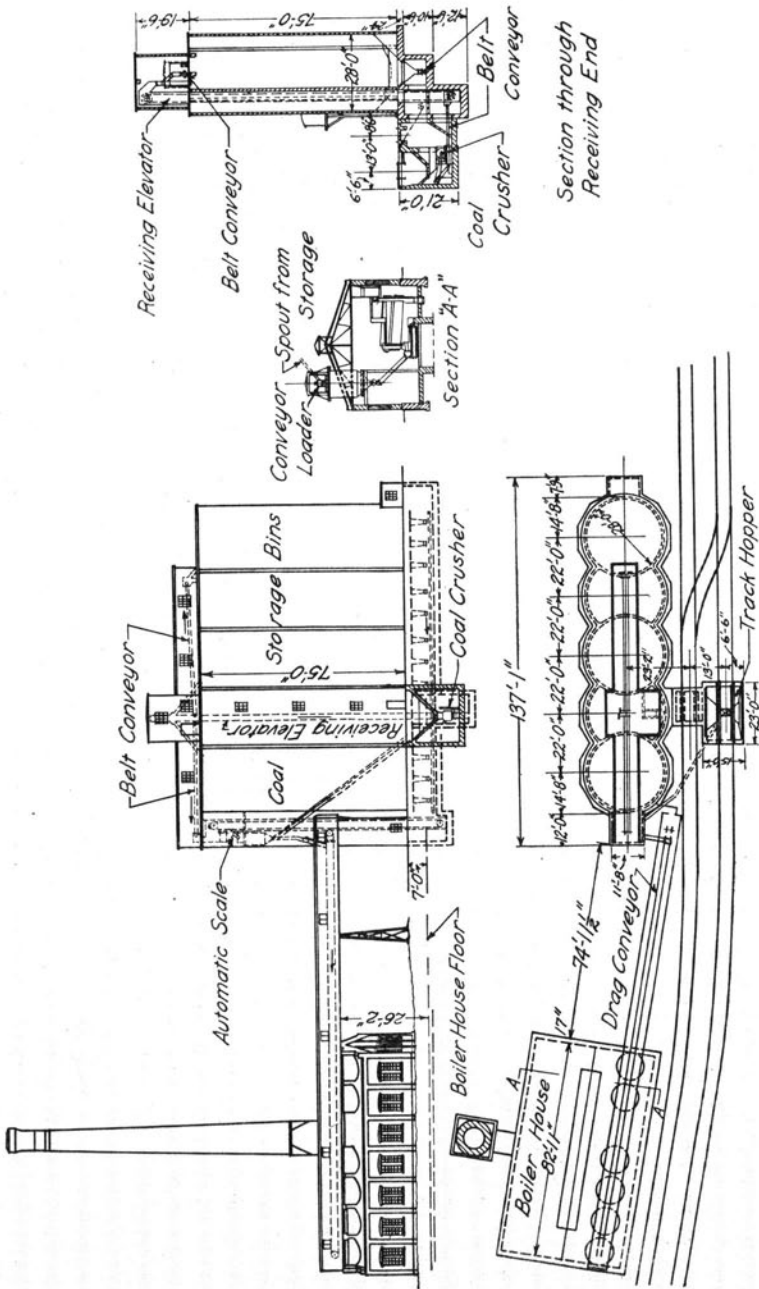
SIDE ELEVATION, PLAN, AND SECTION OF COAL STORAGE PLANT OF AMERICAN HOMINY COMPANY, INDIANAPOLIS, INDIANA
